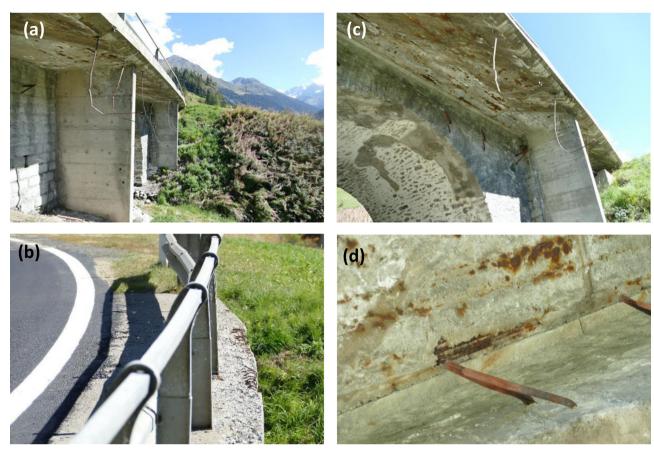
Presentation of Bridge II and detected damage. (a) Photograph of the bridge; (b) Photograph of the bridge of the concrete slab and the masonry arch; (c) Damage on the kerb; (d) zoom on the damage on the slab next to the masonry arch.
